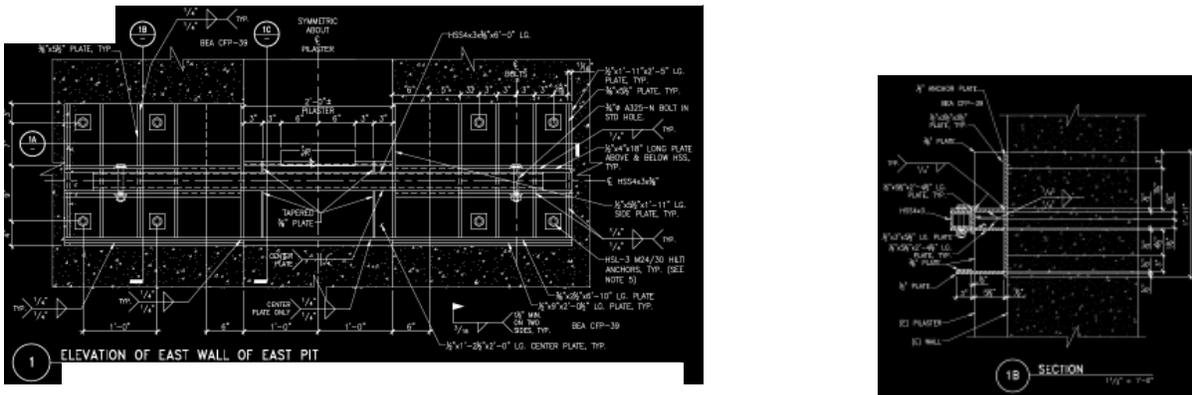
Upgrade Design – East Pit East Wall Elevation and Side View
